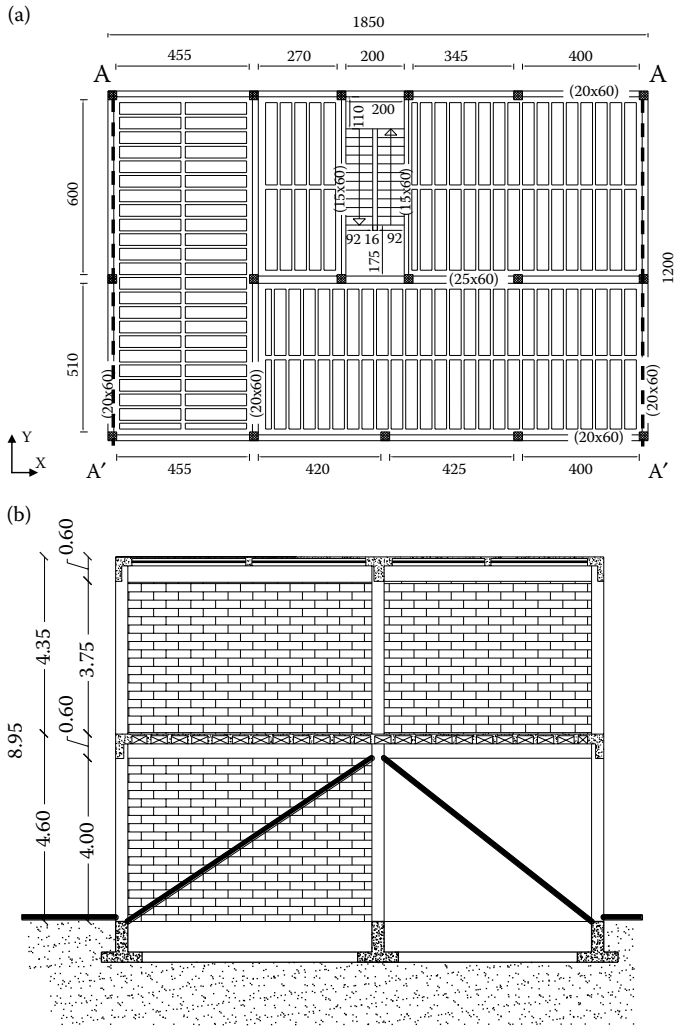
The building equipped with BRBs: (a) structural plan; (b) brace configuration.
